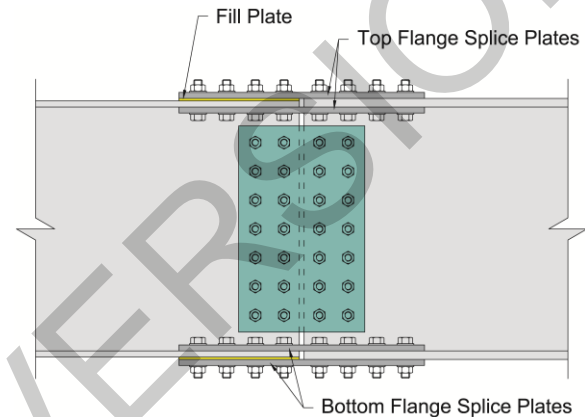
Typical Bolted Field Splice for an I-Section Flexural Member
